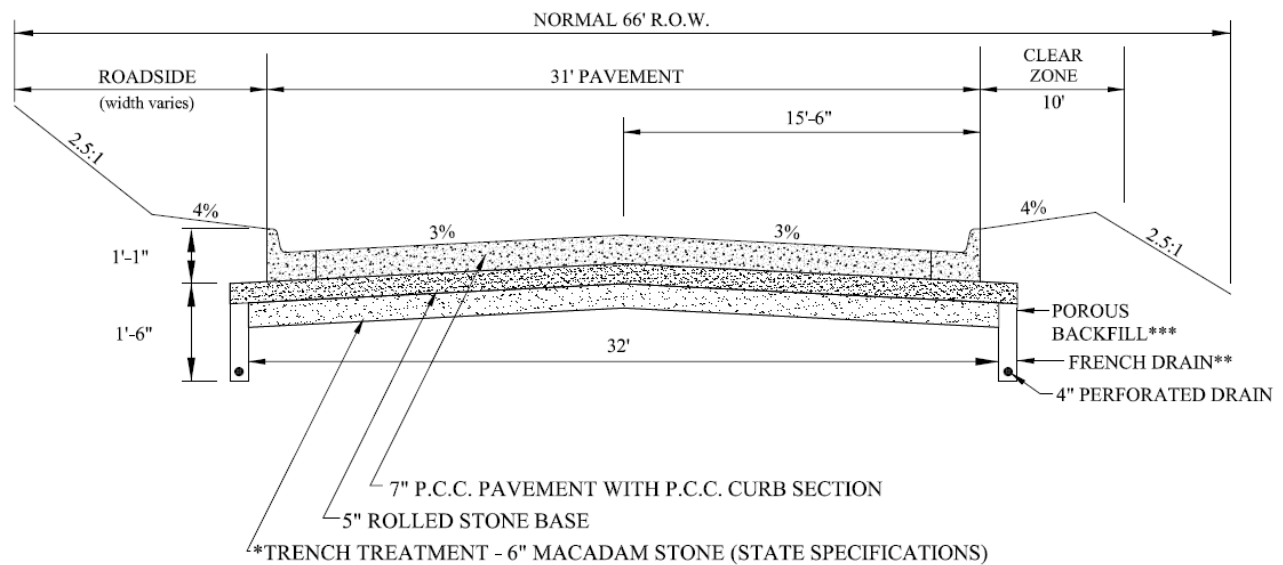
TYPICAL MINIMUM P.C.C. PAVEMENT - CLOSED DITCH SECTION
